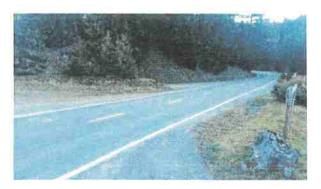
Photograph showing the intersection of Road 1 (Titlow hill Road) and Road 2 (Old Highway 299). The Road 2 access point is at mile post markers is 0.55 miles on Titlow Hill Rd. Road 2 is paved, meets Category IV standards.
